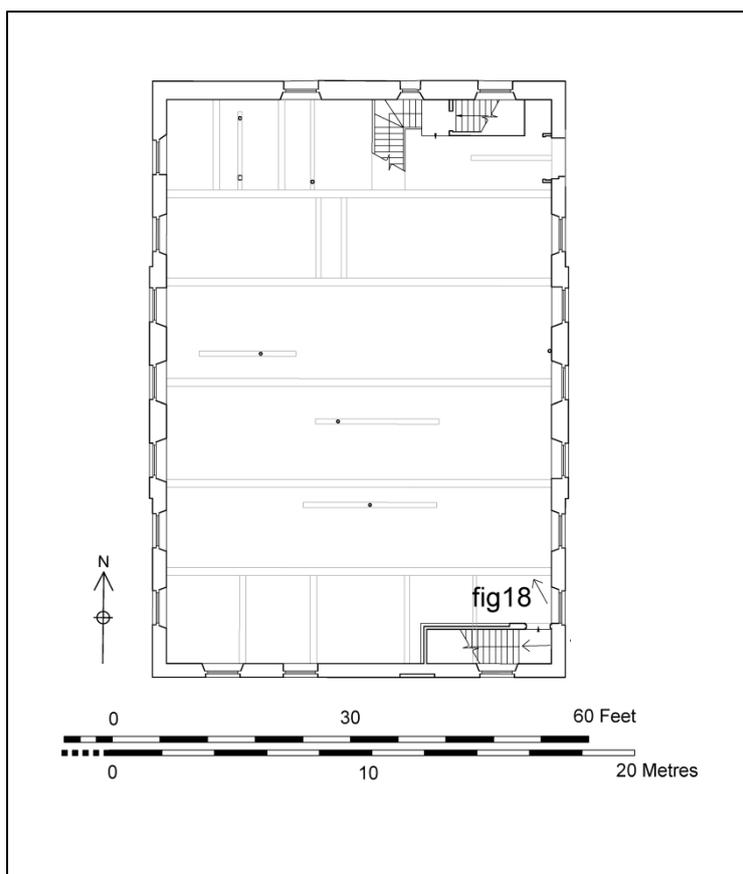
Location of figure 18, on second floor plan of Friars Mill (plan produced by Greenhatch Architects).
